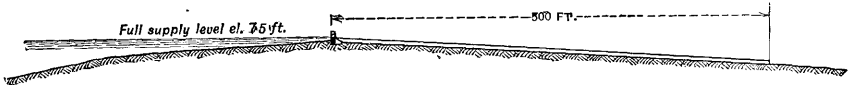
Profile of wasteway, rock-filled dam, East Park dam site.
